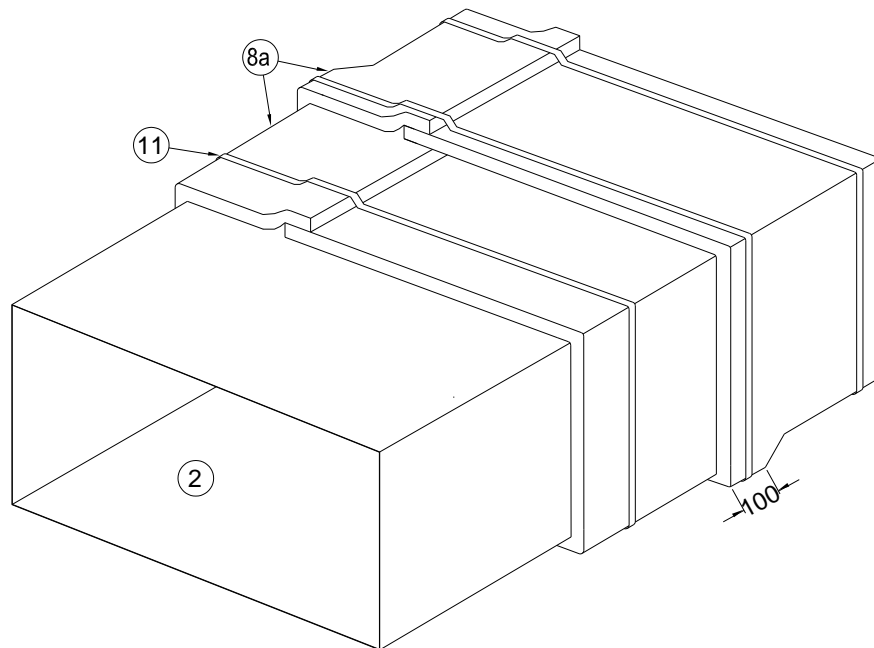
Typical detail of vertical assembly duct jointing
